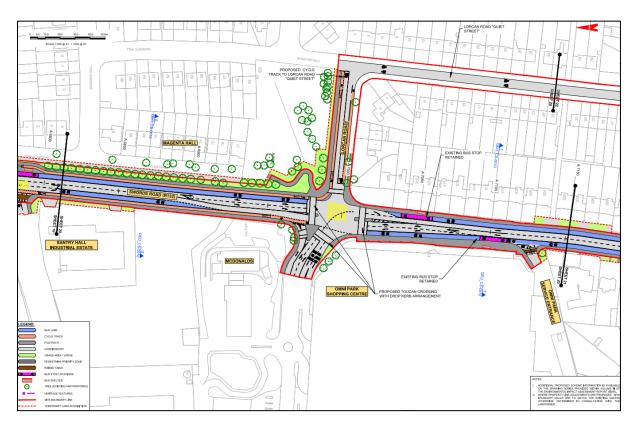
Extract of the Proposed Scheme General Arrangement Drawings (Sheet 20)
